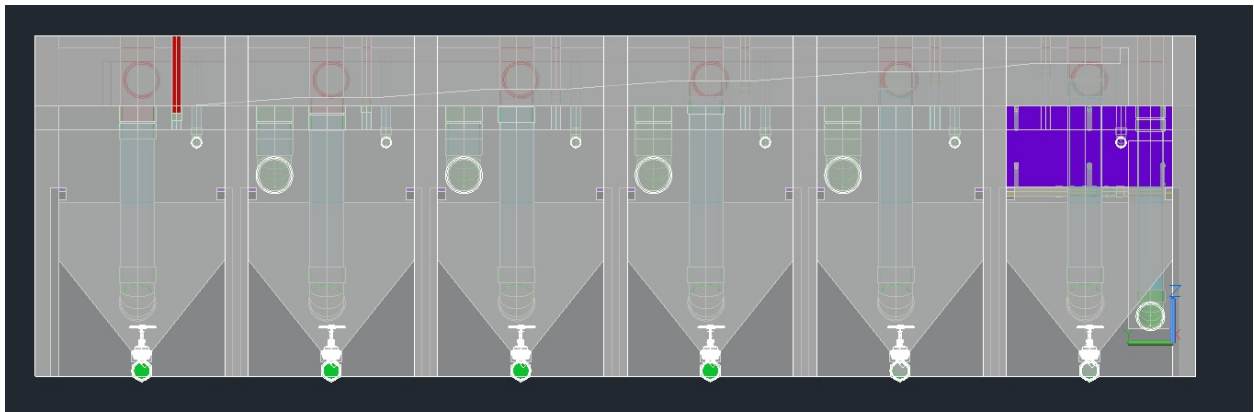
Inlet Channel With Angled Floor and Correct Pipe Placement
